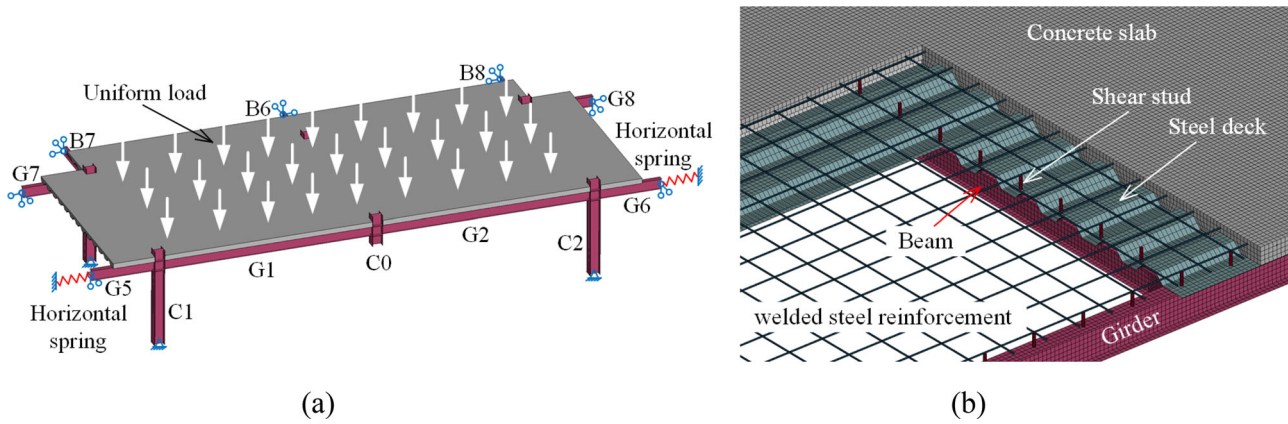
FEM details: (a) overall view of the model, (b) finite element mesh details.
